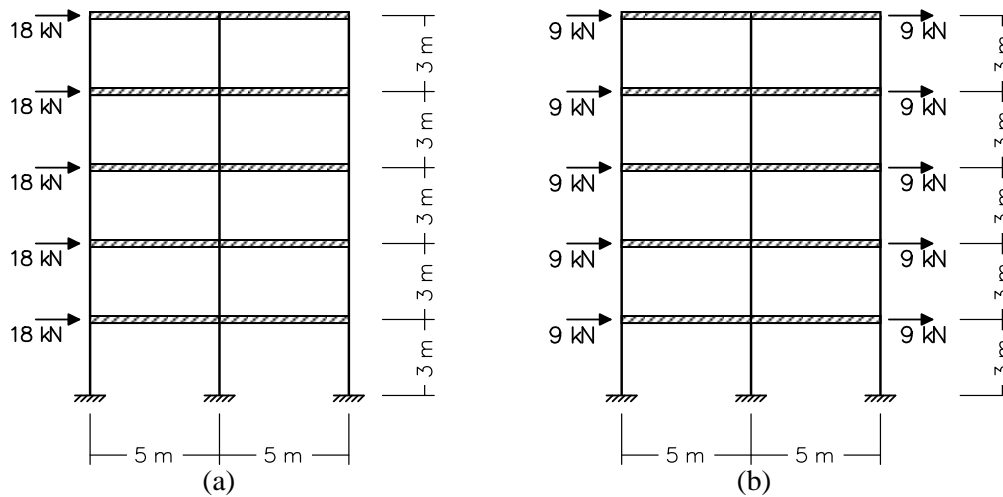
Shear building structural model with (a) asymmetric loading and (b) symmetric loading.
